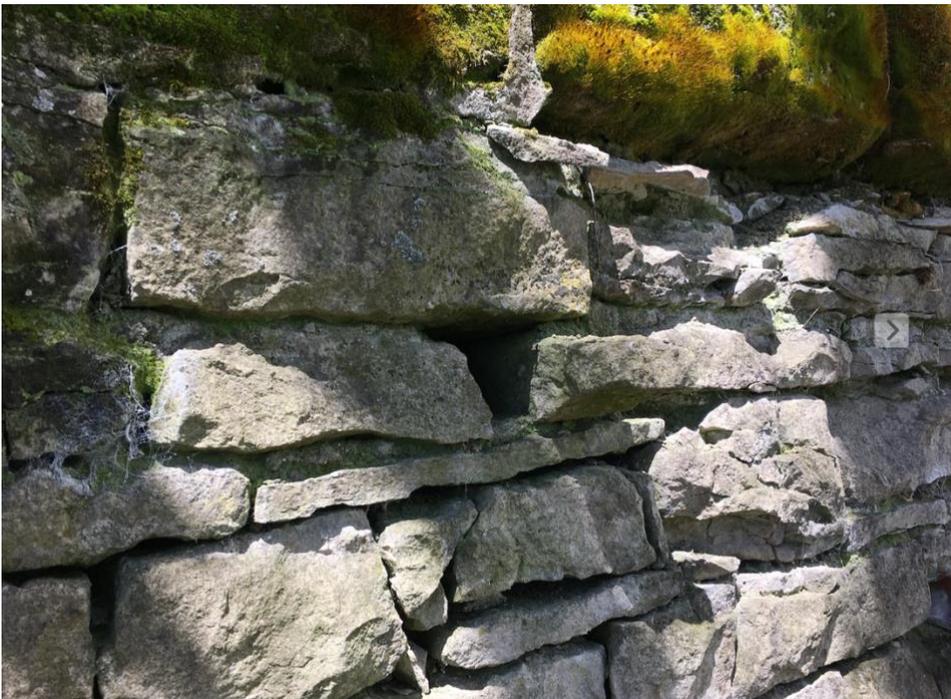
Possible original drainage outlet found on the eastern retaining wall (Preservation Designs, May 2021).
